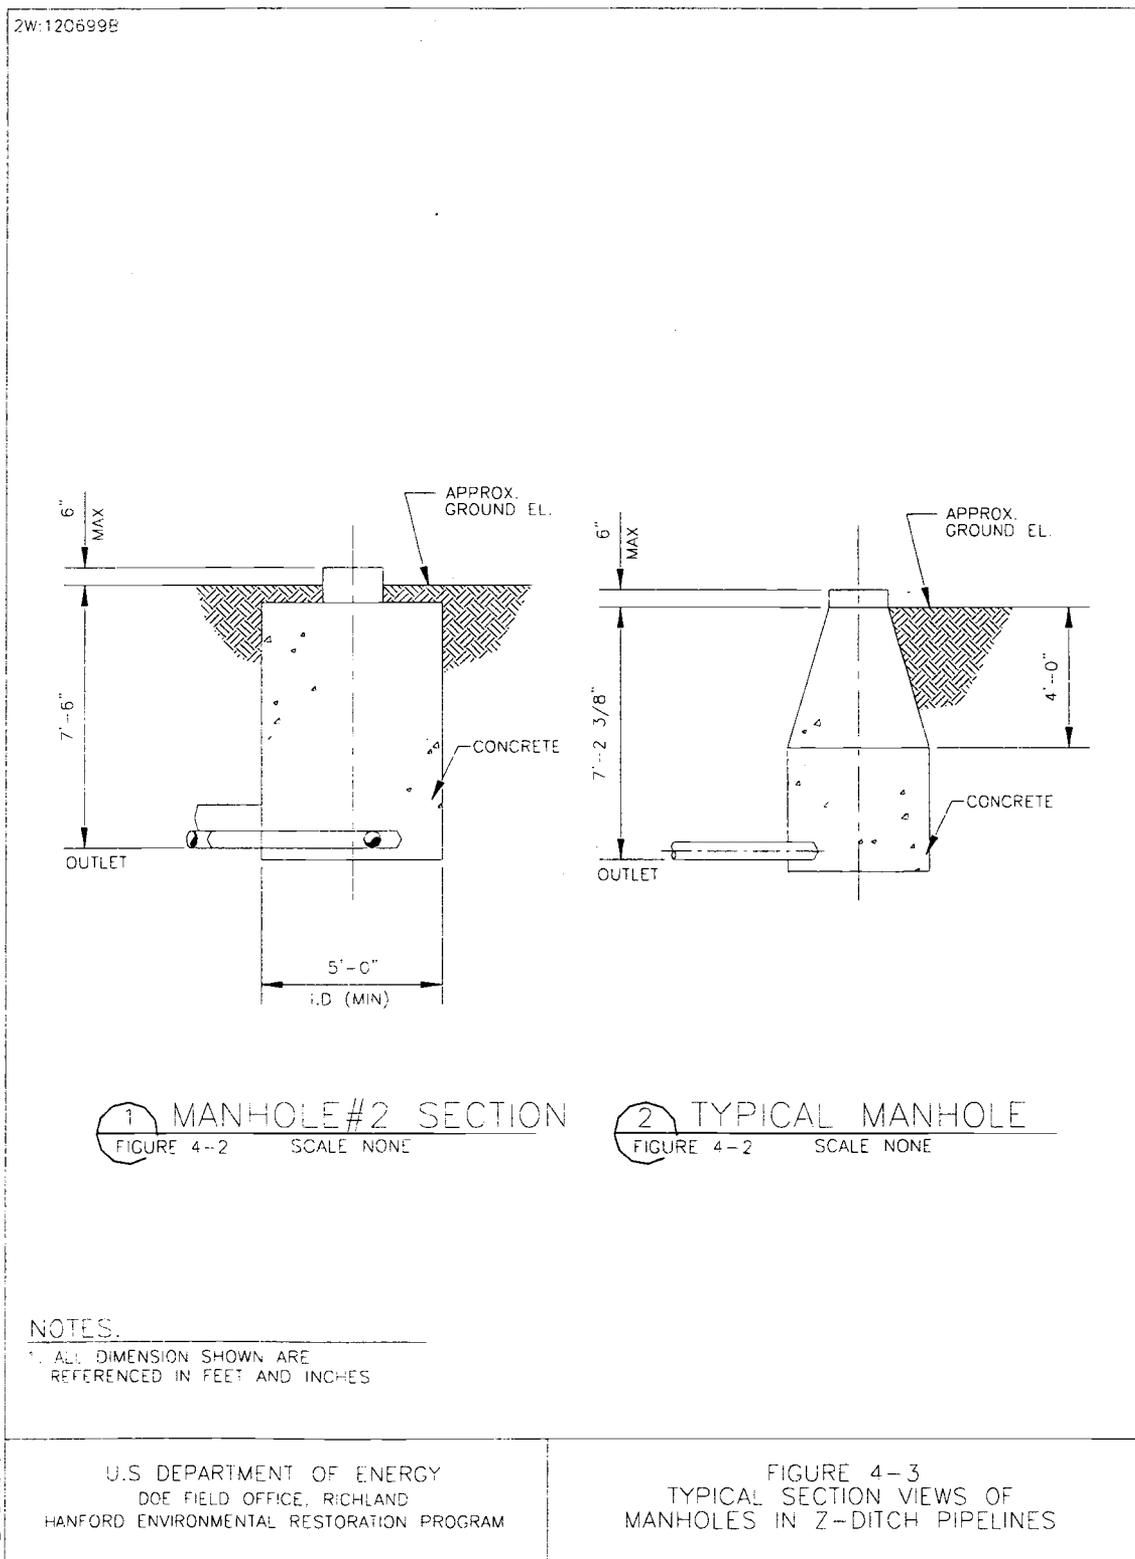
Typical Section Views of Manholes in Z Ditch Pipelines.
